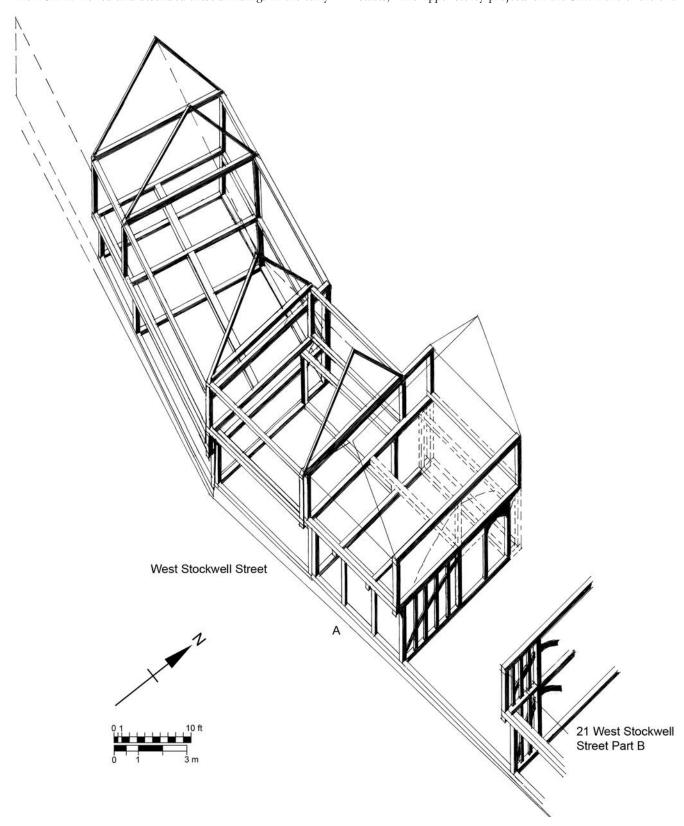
Isometric view of buildings to the north-west of 21 West Stockwell Street (corpus no. 103)
